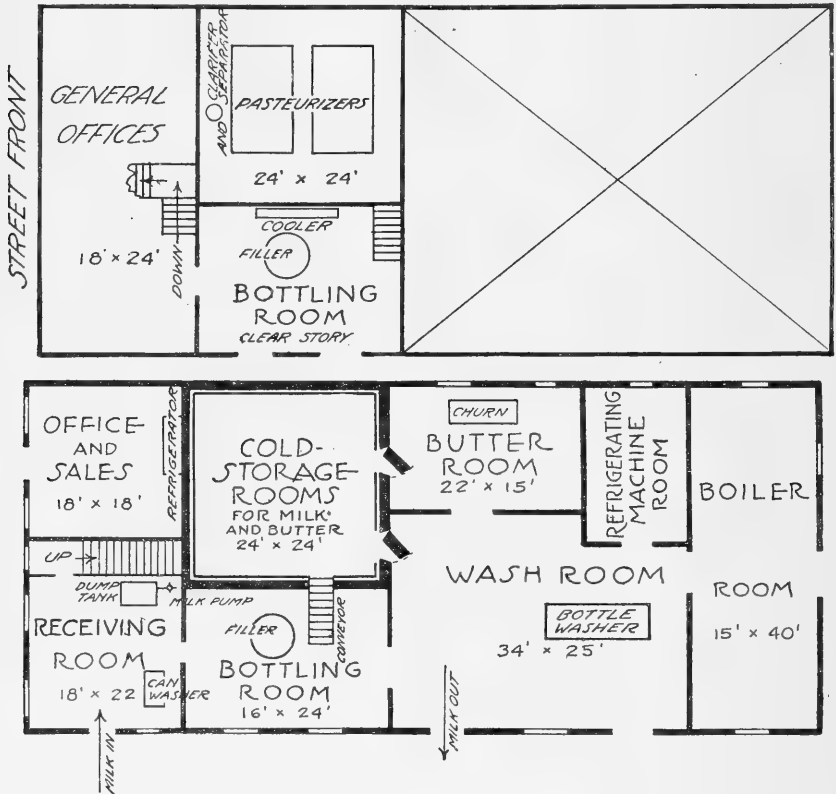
Floor plans for a $1\frac{1}{2}$ -story plant of from 1,500 to 2,000 gallons' daily capacity, where butter also is handled.
